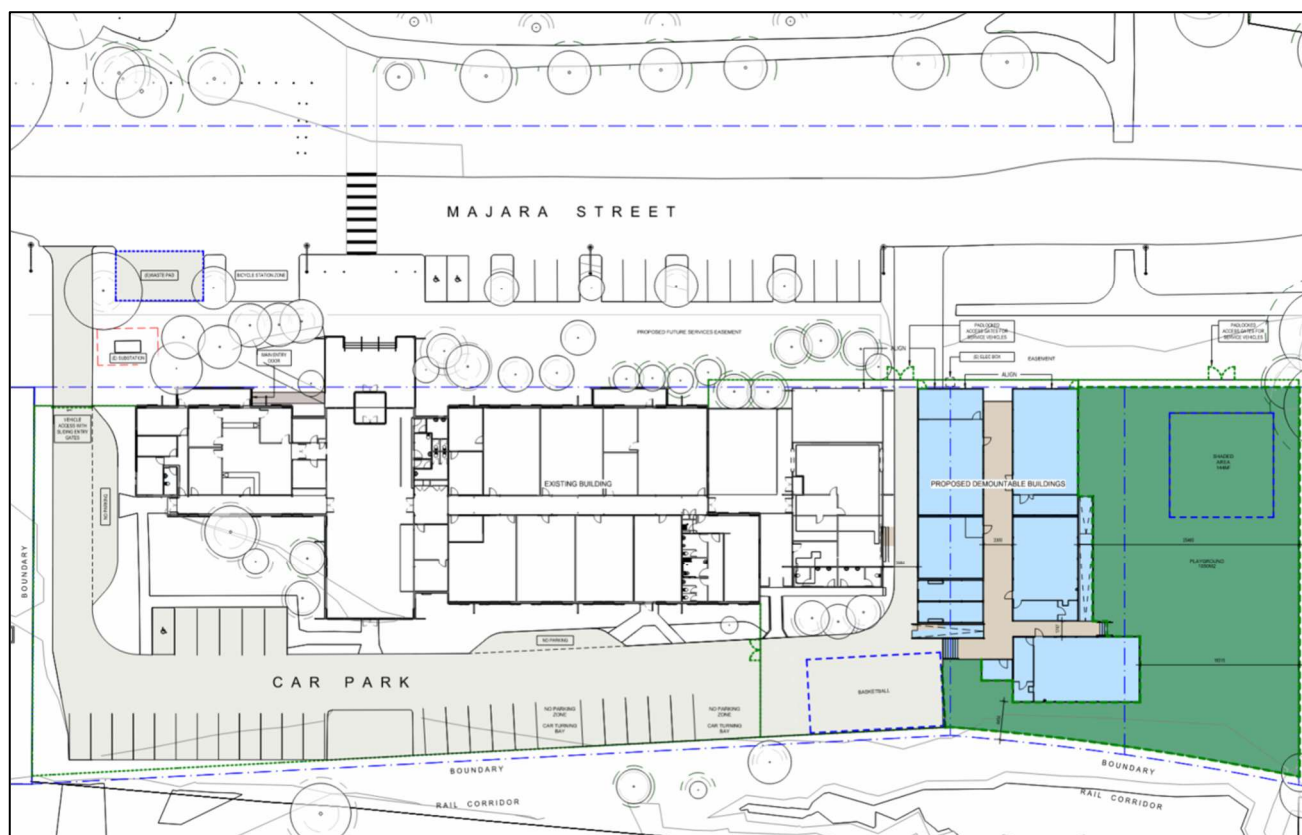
Overall Project Site Plan (Source: TKD, 2025)
